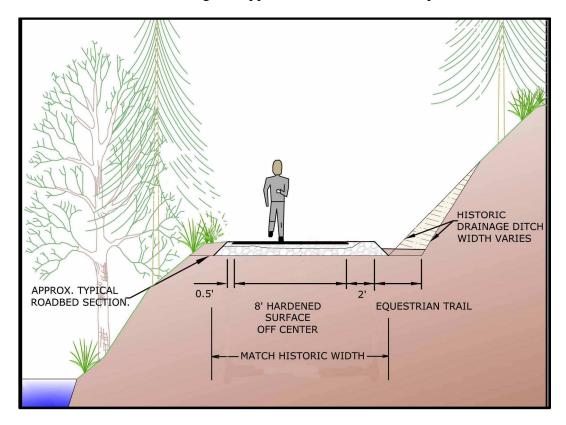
Trail profile (historic railroad sections) for Alternative 4
